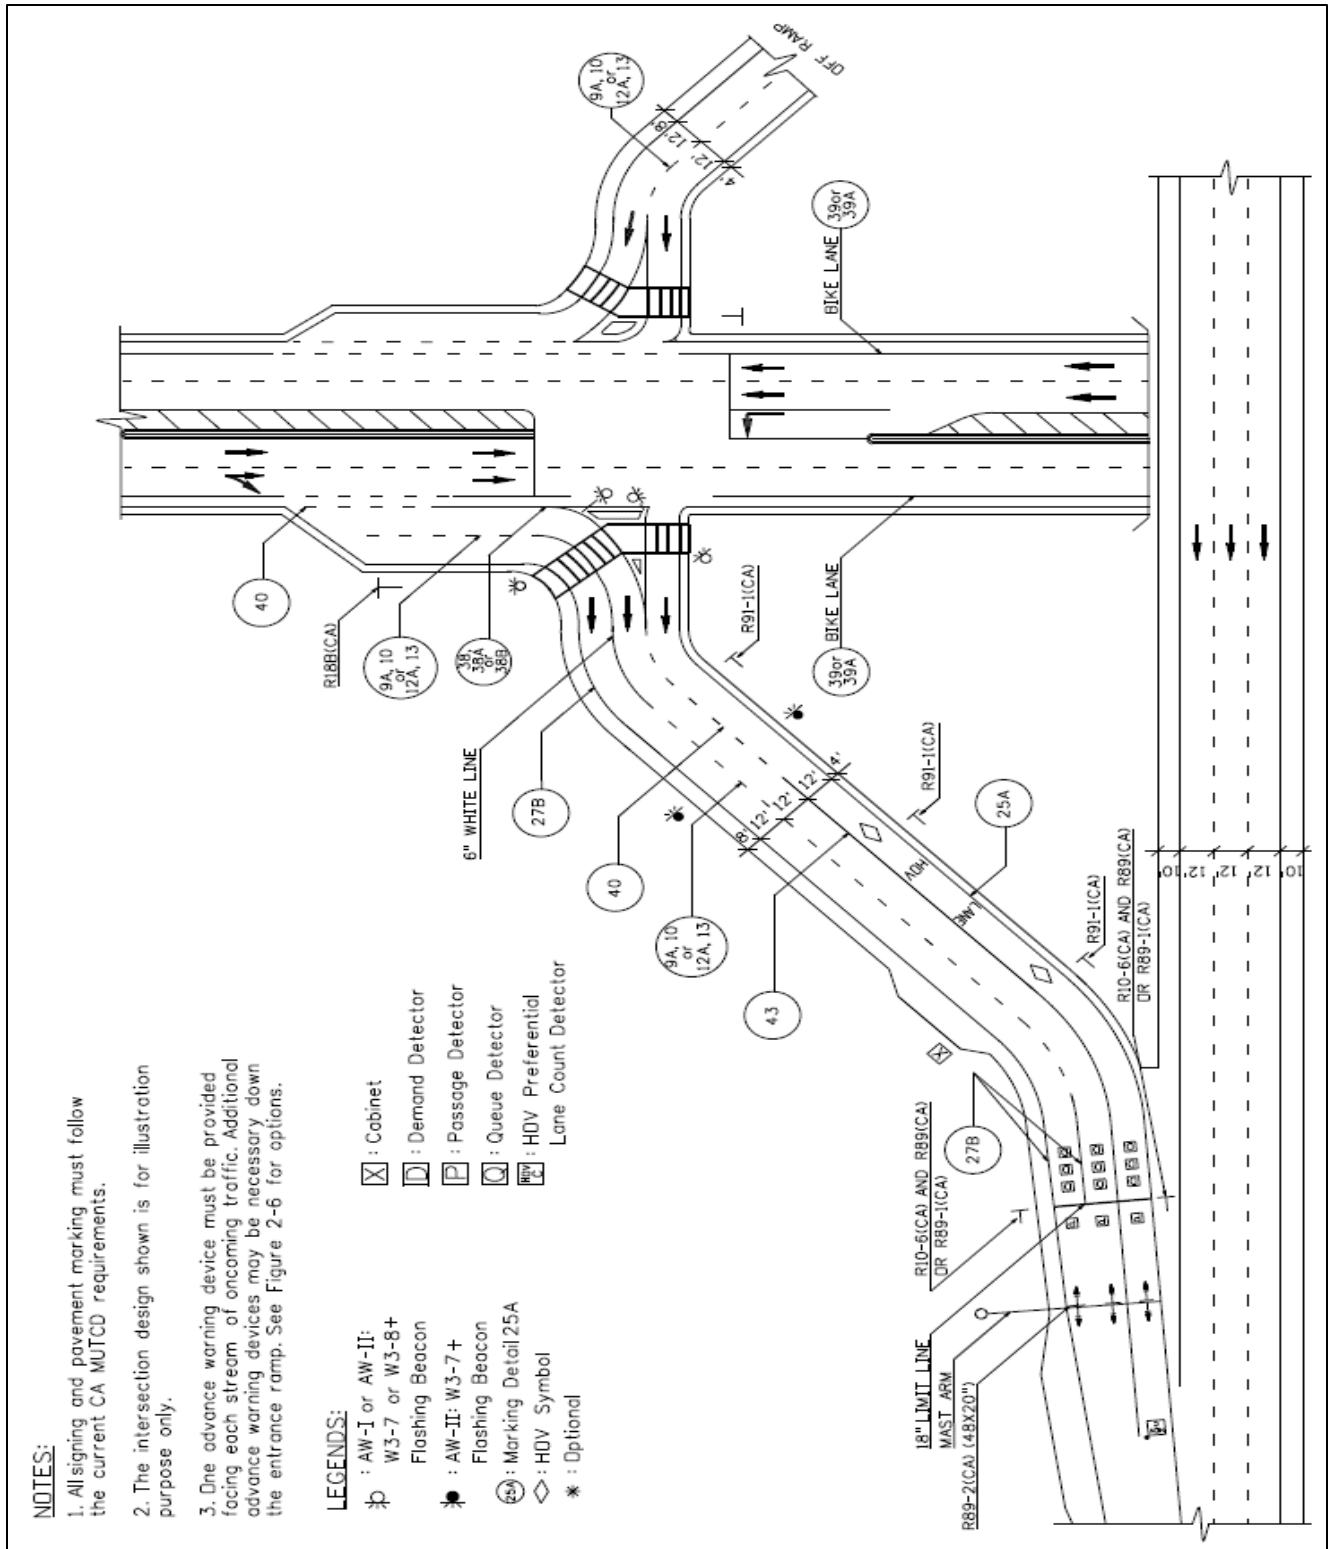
Typical Signing and Pavement Marking (3-Lane Loop Entrance Ramp, 2 GP Lanes + 1 HOV Preferential Lane)
